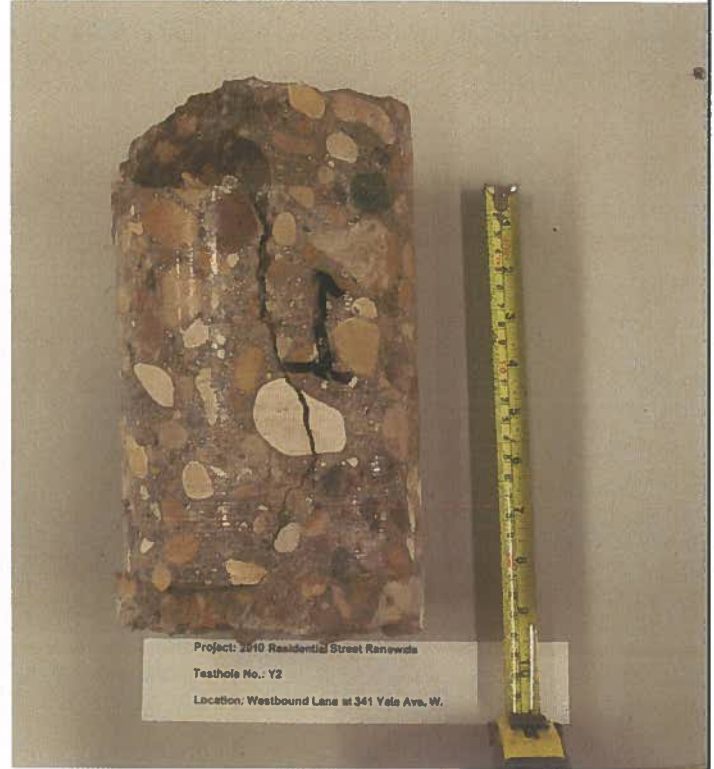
Test Hole Y2: 341 Yale Ave. W., Westbound Lane, 60 m E of E sidewalk at Madeline St., 1.9m S of N curb
